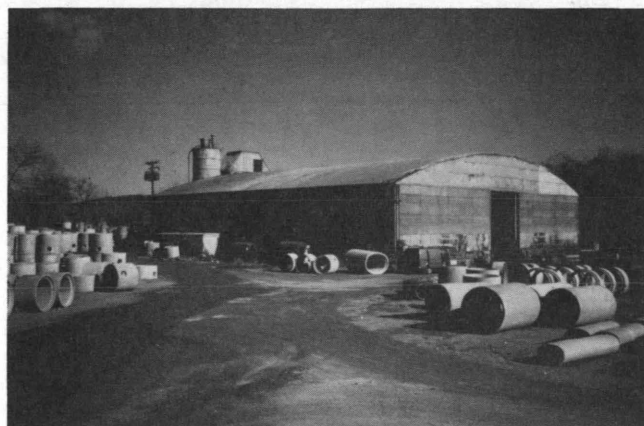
Concrete pipe manufacturing facility before construction (fall 1988).
